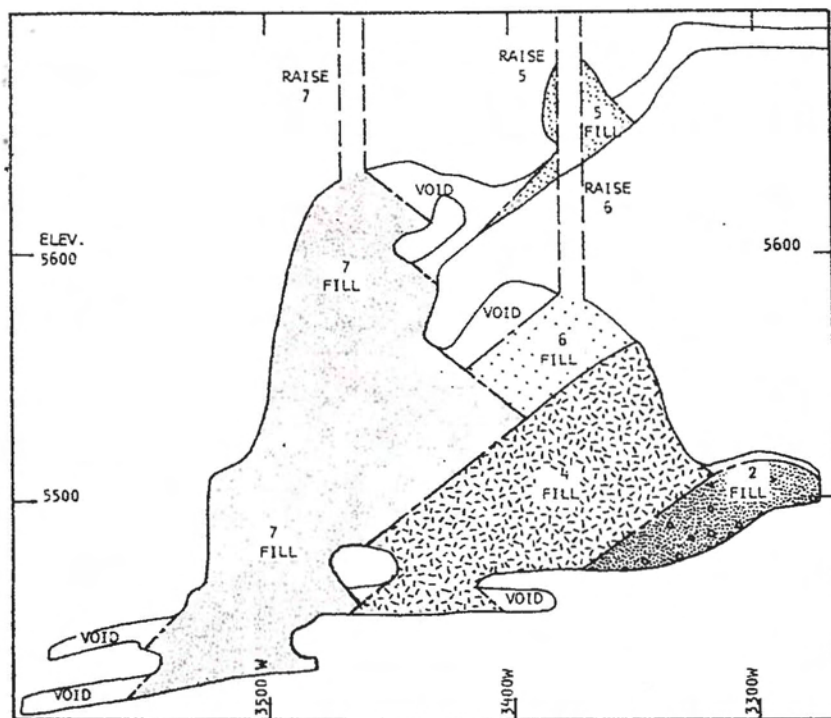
Composite longitudinal section showing 450N Stope fills in part of stope. Elevations and distances in feet.
